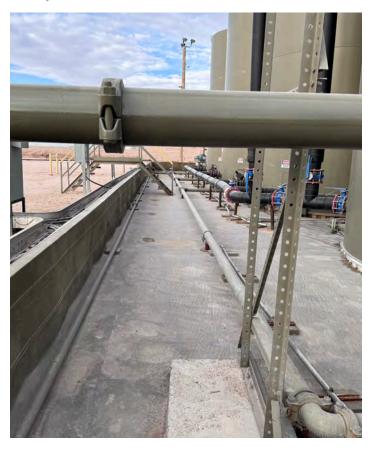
Looking southwest viewing liner near equipment and under piping.
